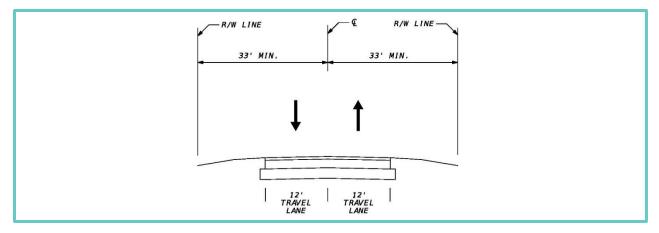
| Typical Section – Existing Lorraine Road from 59th Avenue East to SR 64
